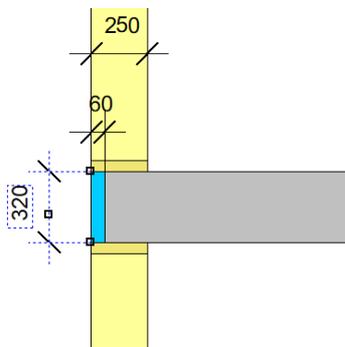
Aerogel insulated thermal bridge. The walls are constructed using insulated framework and the floor is a hollow-core concrete slab protruding 190 mm into the wall.
